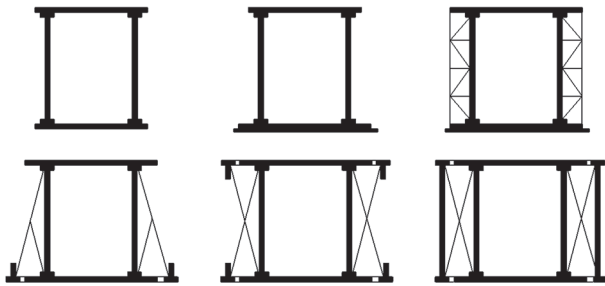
Arch cross-section construction phases for big span of Krk Bridge [1]
